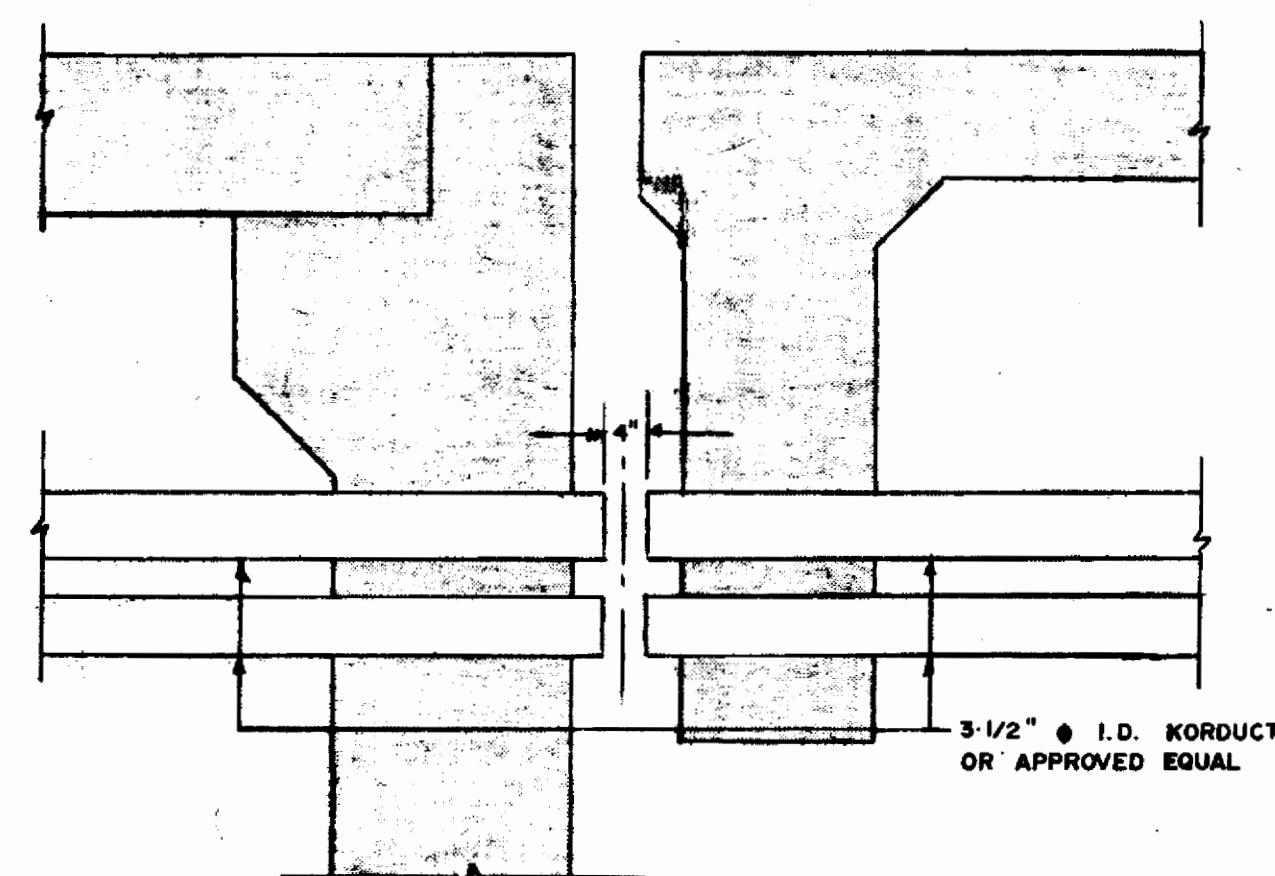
DETAIL OF HOLES IN CONCRETE DIAPHRAGMS
